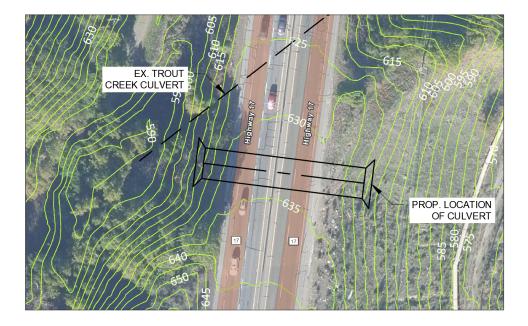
Close-up plan view of culvert layout displaying critical elevations.
